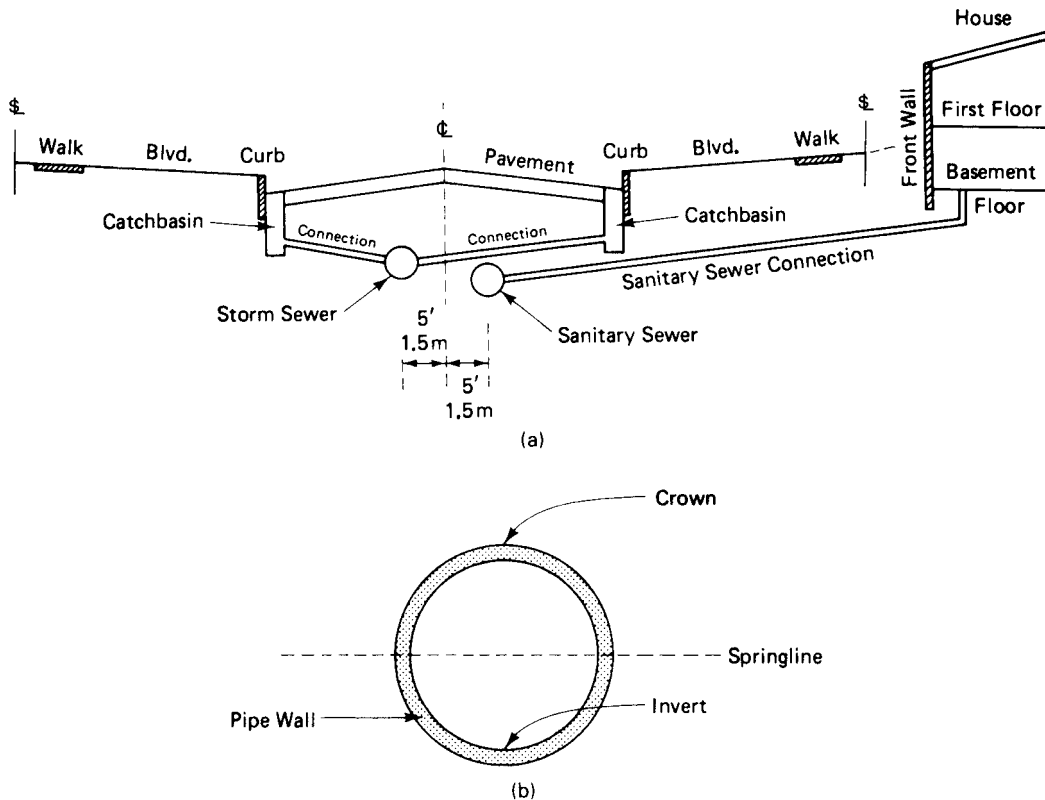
(a) Municipal road allowance showing typical service locations. (b) Sewer pipe section.
